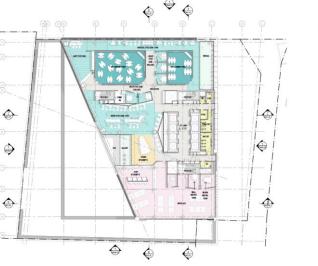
Level 8, 9, 10, 11 and 12 Floor plans
